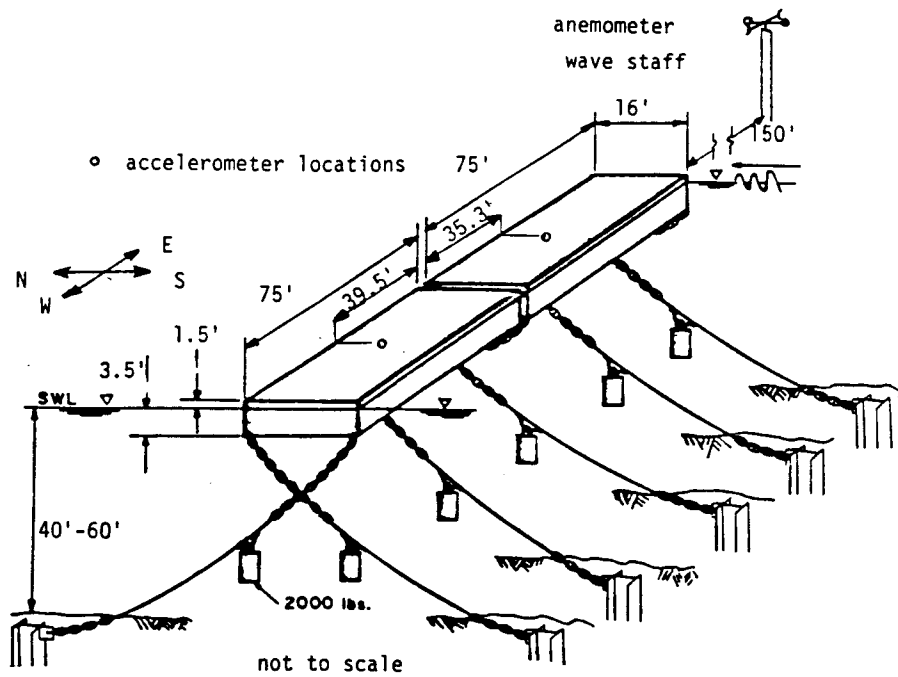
West Point Prototype Floating Breakwater: Project Site Instrument Layout
